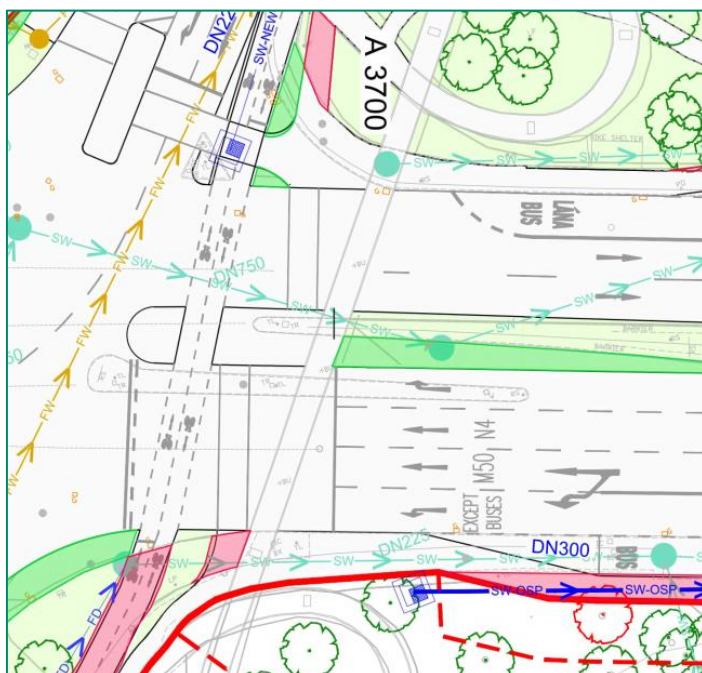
Extract of Proposed Surface Water Drainage Works drawings Ch. A3700 (Sheet 13)
